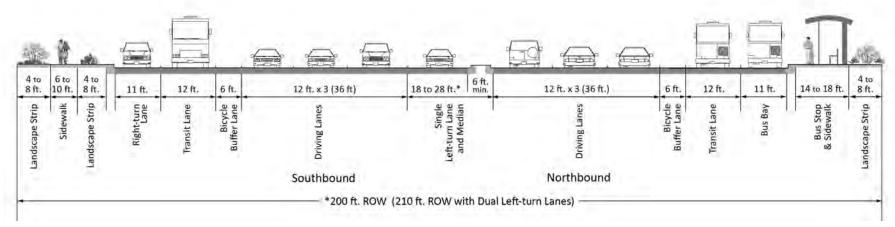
Example 6-Lane Typical Section for COORS BOULEVARD (NM45) from Bridge Boulevard to Central Avenue
